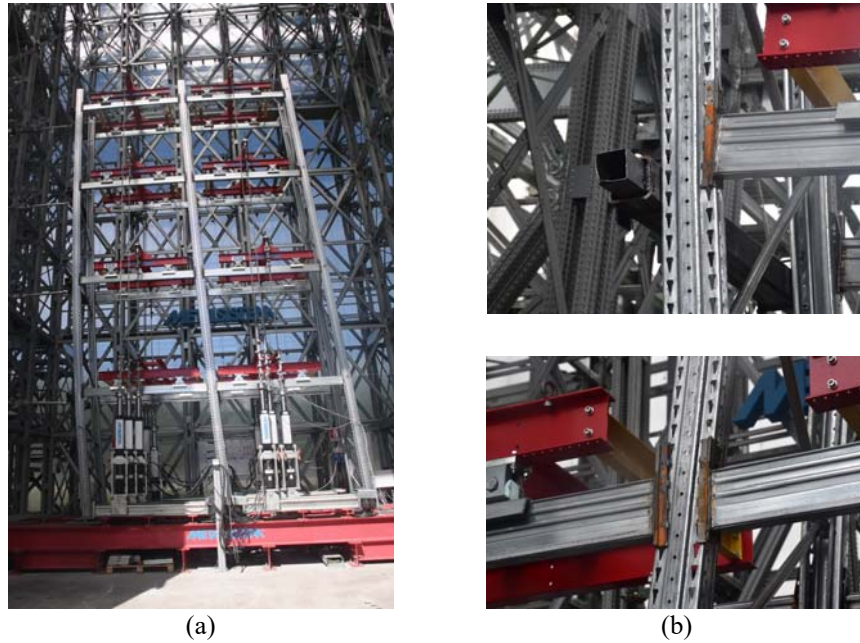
Deformed shape of one frame at collapse (a) and detail of the connections (b).
